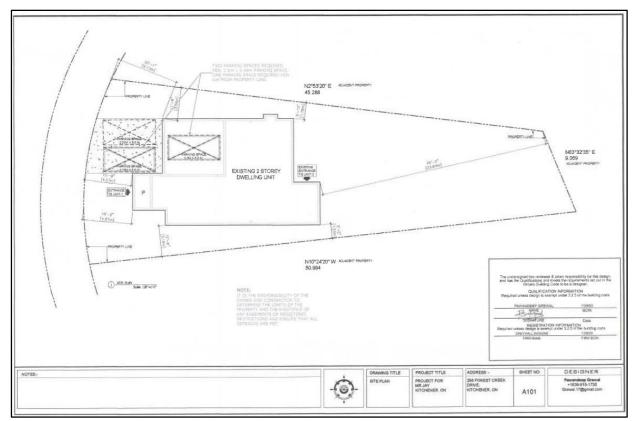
Site plan drawing of the subject property showing 3 parking spaces
